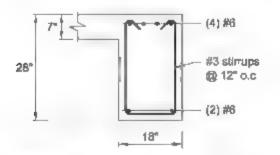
Section A. A. through Beam B1 near connection with Beam B2.
